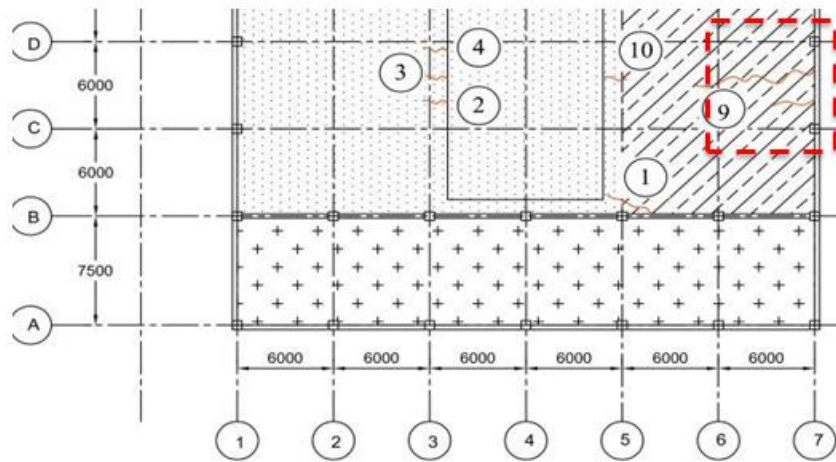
Zoom of Crack Point-9 Location in Floor Plan
